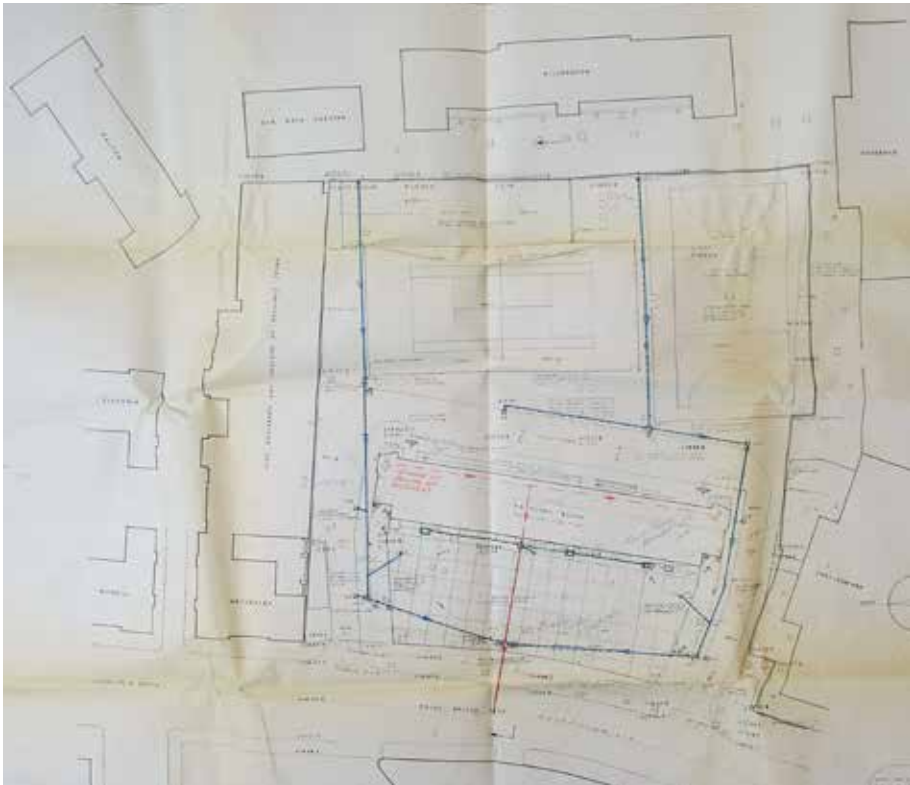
1955 Drainage applications and plans at 41-43 Ebury Bridge Road showing new proposed block Edgson House and play facilities (Westminster Catalogue).
